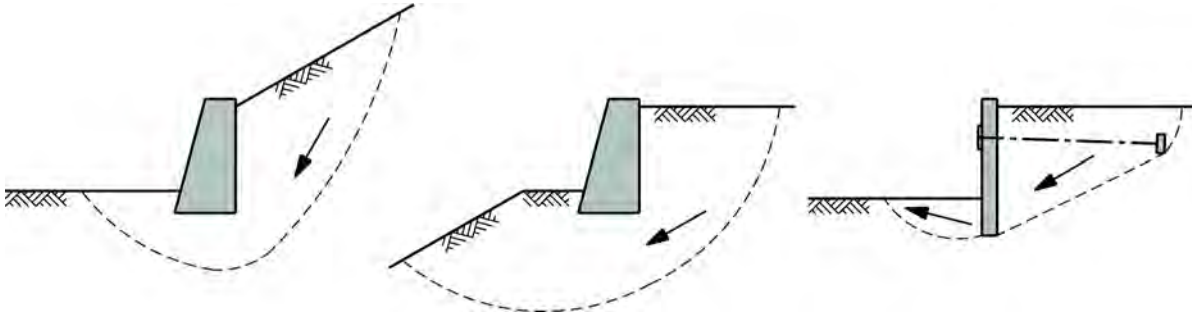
Examples of limit modes for overall stability of retaining structures
